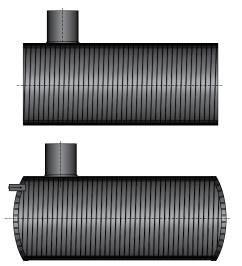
Example of manhole solutions – horizontal tanks made of structural pipes.
